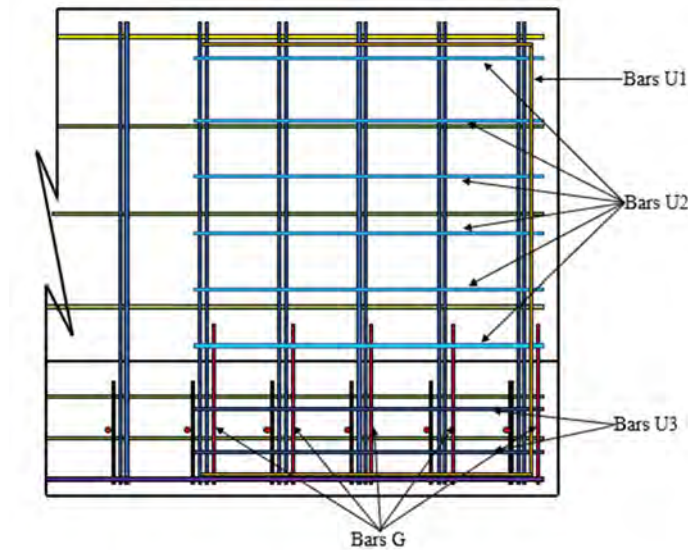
End Face Elevation View of 30 Degrees Skewed ITBC
